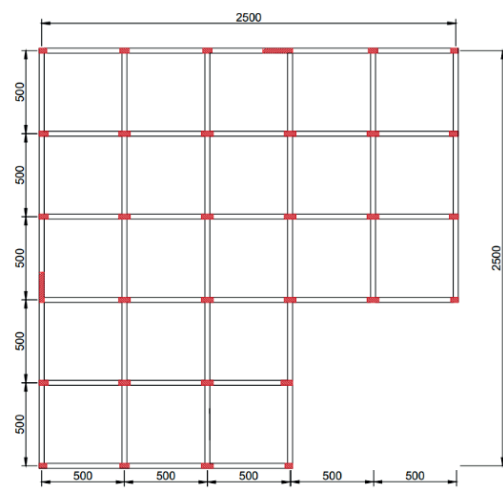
Floor Plan for (MRF+SW) in Irregular Form
